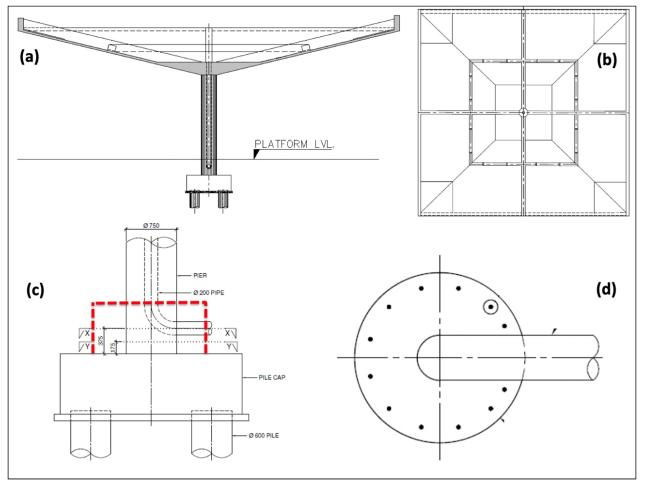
(a) Elevation of RCC canopy of platform (b) Plan of the roof (c) Elevation at the bent drainage pipe (d) Effective cross section area at bent drainage pipe
